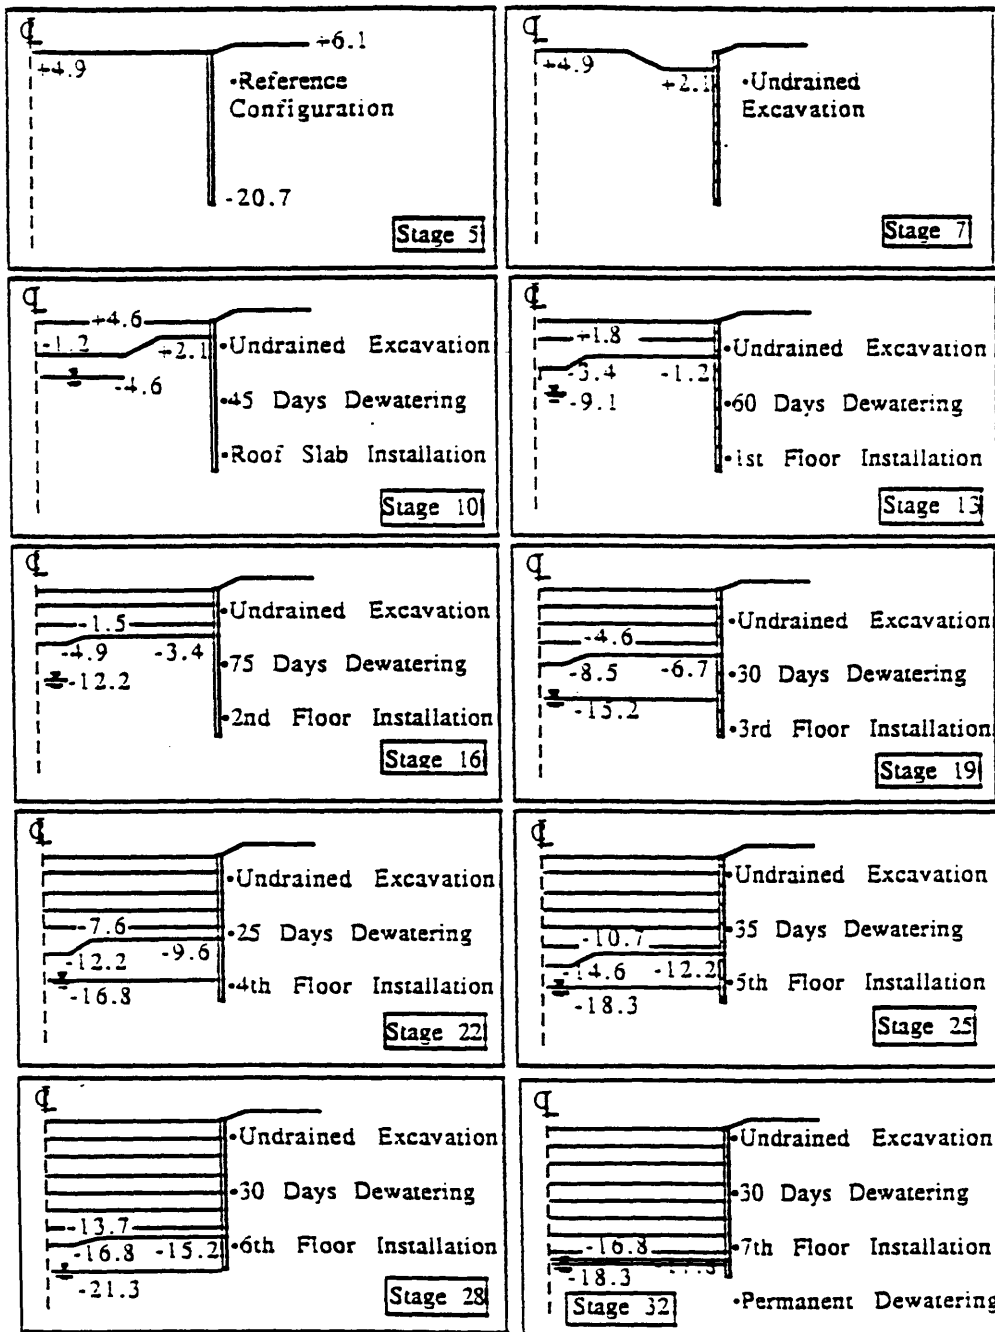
Construction sequence used in finite element model. The simulation includes detailed modelling of construction berms and de-watering schemes based on the actual record of site activities.
